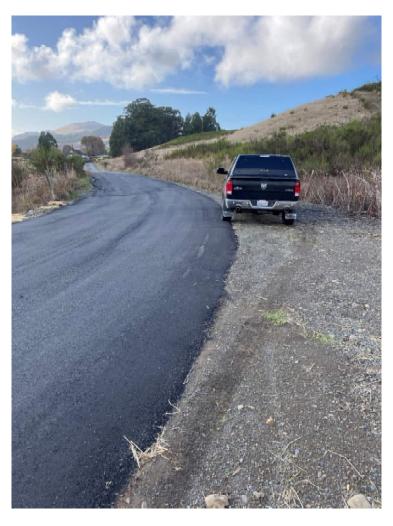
Representative of RS2 conditions (looking west). Details asphalt surface, 20'+ average road width, shoulders, turnouts, crowned geometry with fair drainage, average slopes <5%.
